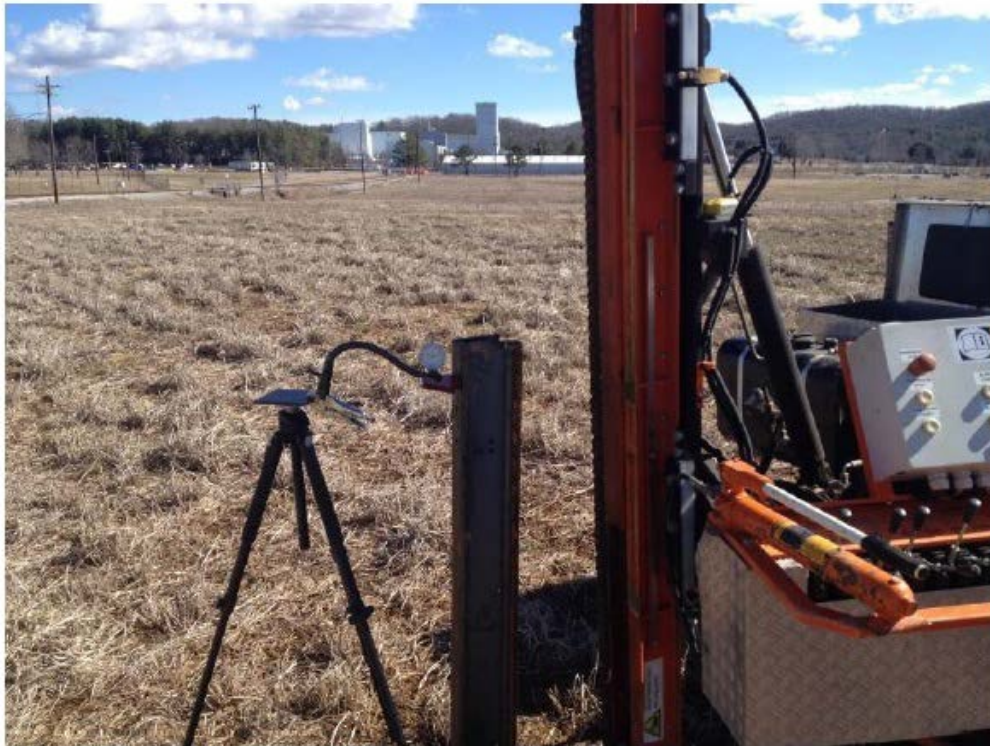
Pull-out and lateral load testing at the Powerhouse Six site to assess soil conditions. Photo: RSI
